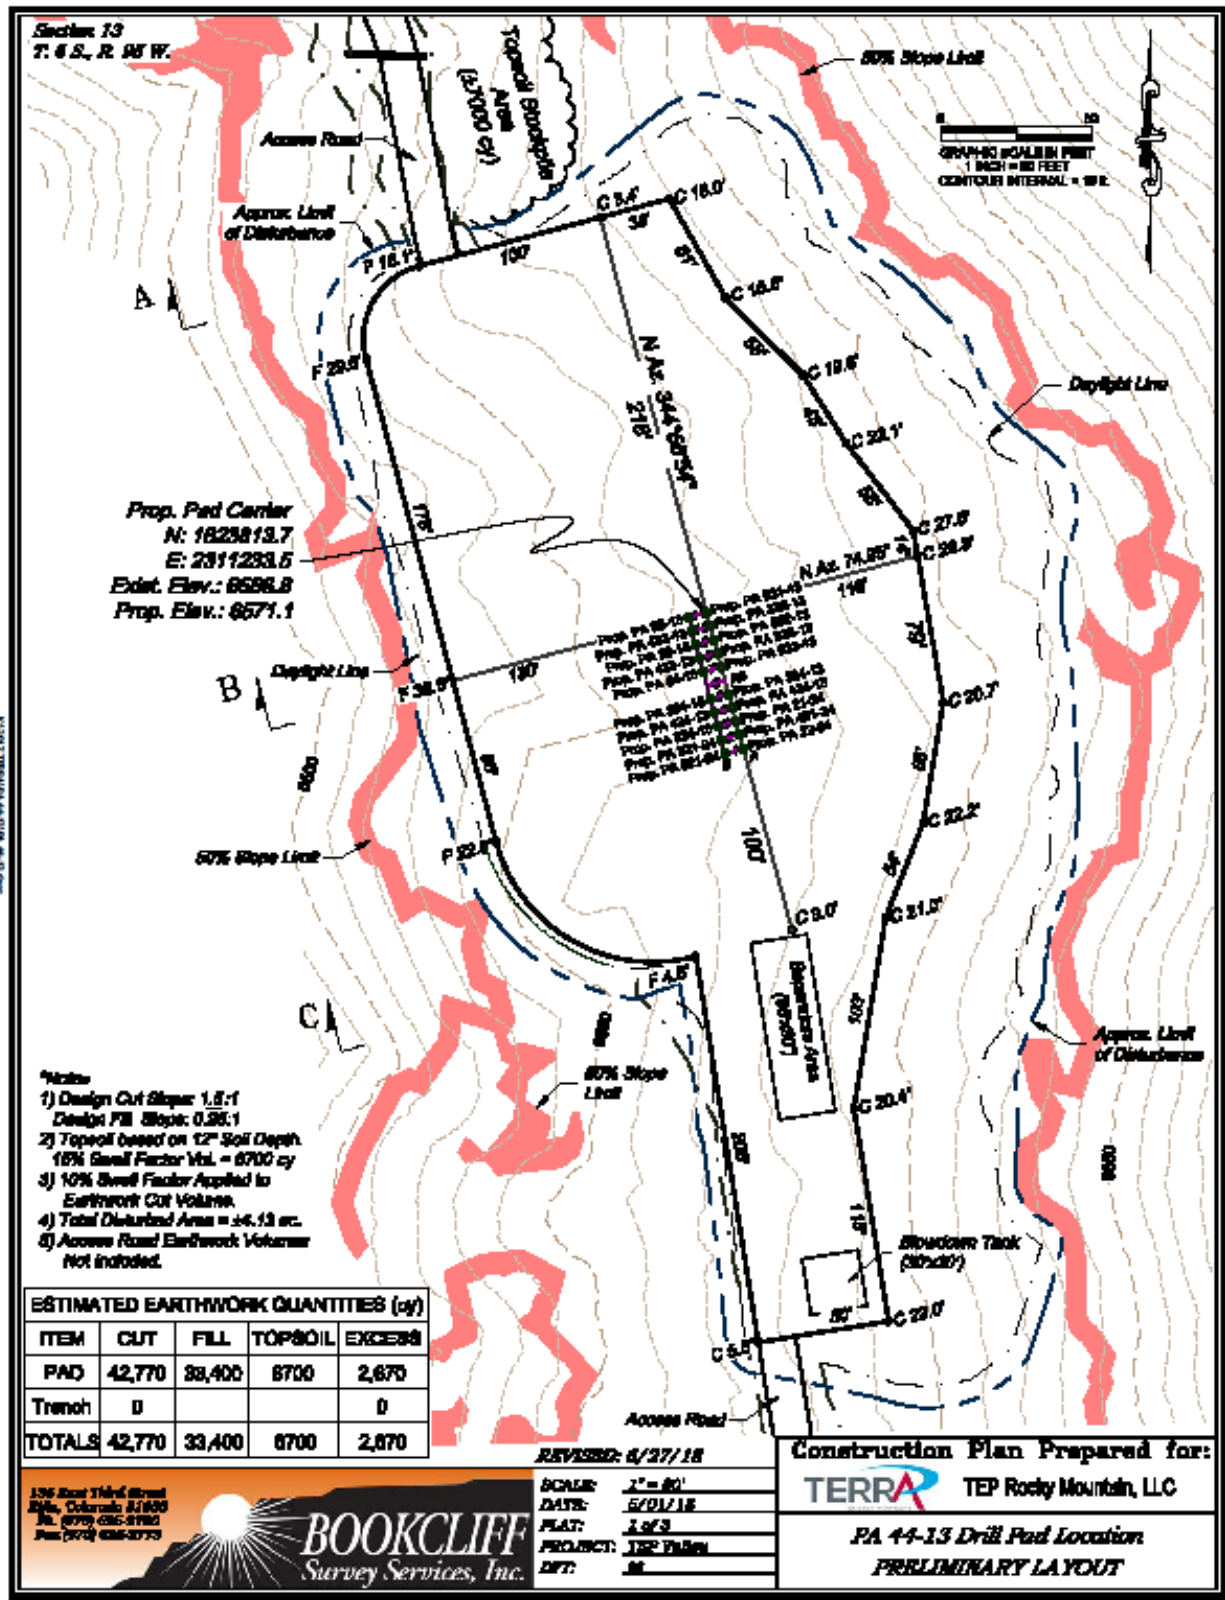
Construction Layout for the PA 44-13 Pad – Preferred Alternative
